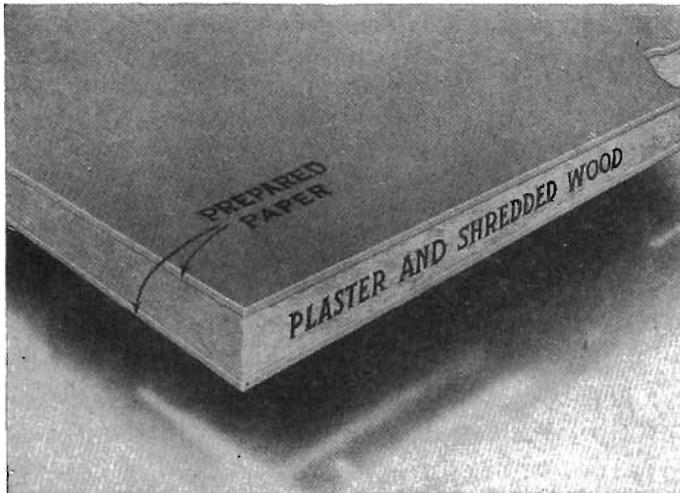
Section of gypsum wall board. Courtesy of Beaver Board Co.
